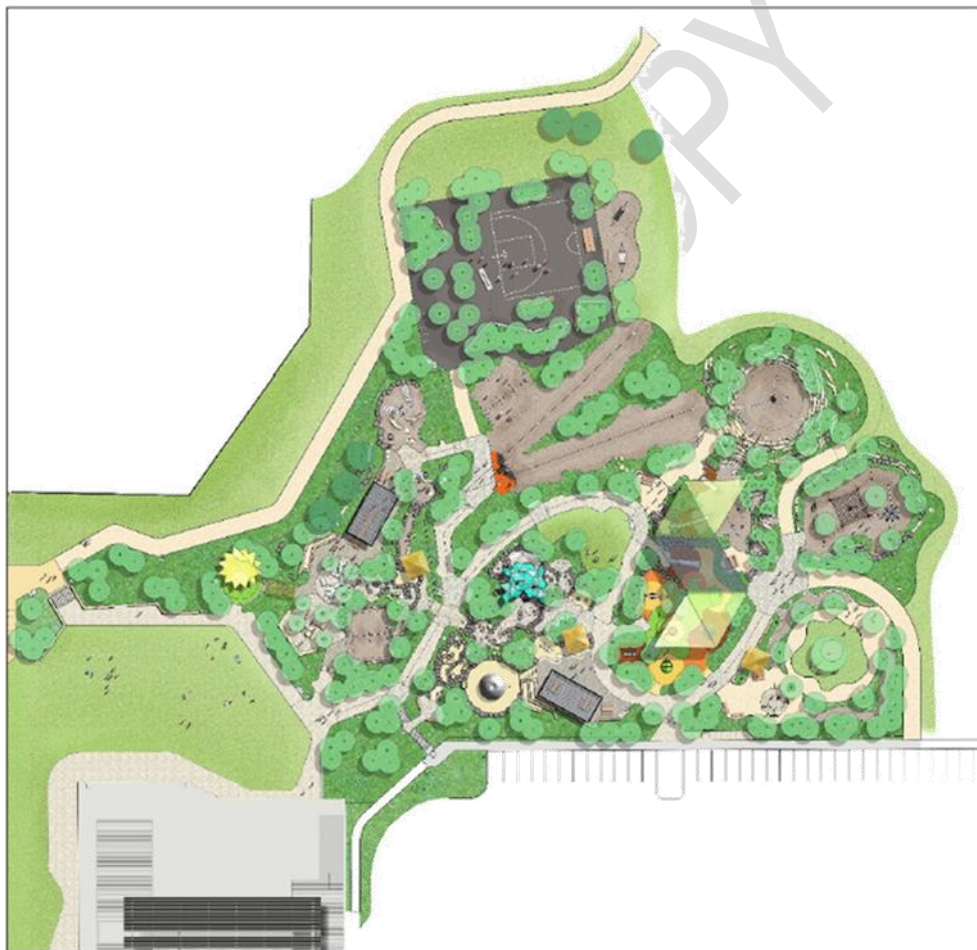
Landscape Plan (indicative), Kingston Park Playground (image supplied by: Playstreet [www.playstreet.com.au])
